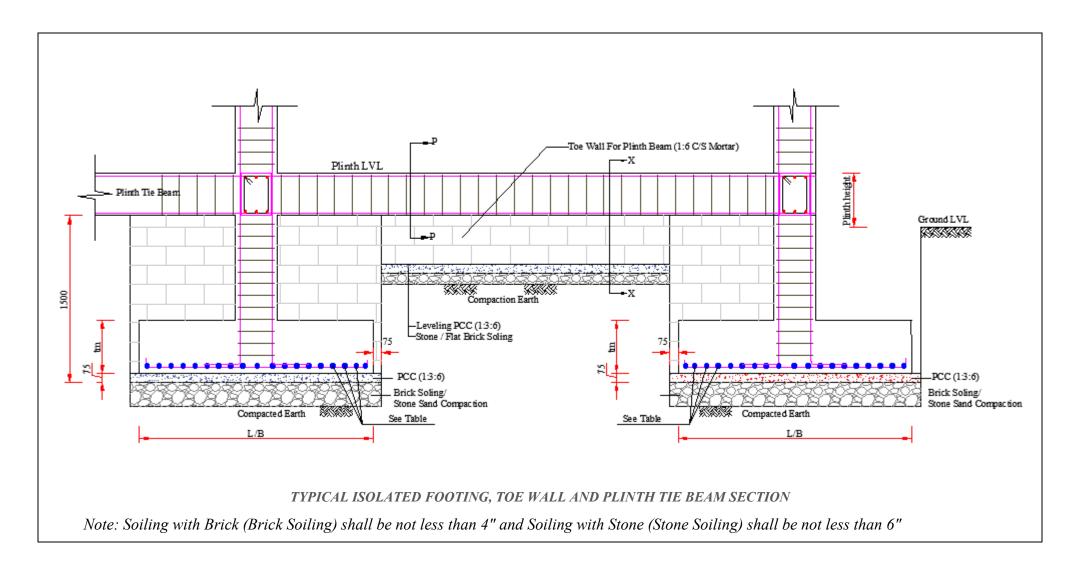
TYPICAL ISOLATED FOOTING DETAIL OF THREE STOREY BUILDING
